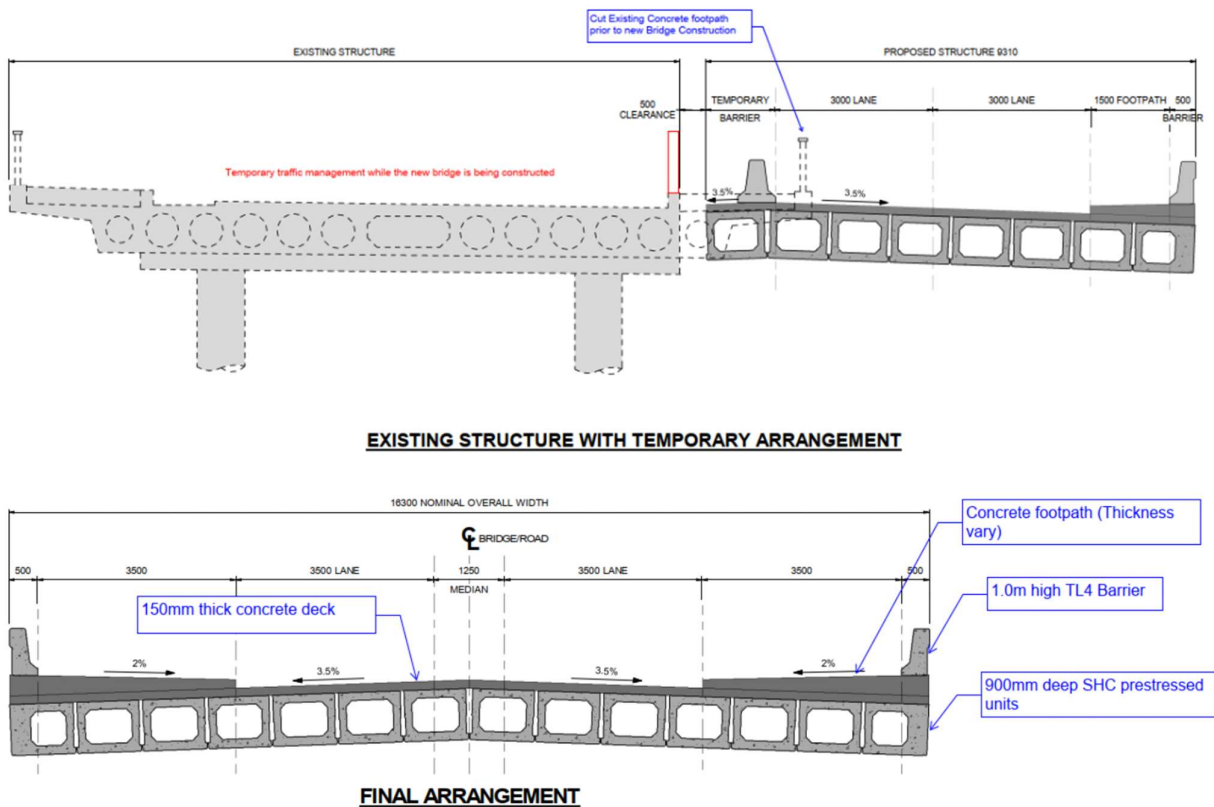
Ghuznee St Bridge potential construction methodology. Upper figure shows intermediate stage and the lower figure the completed arrangement. Source: 03 TT Design Assumptions, Details and Construction Considerations produced by Waka Kotahi April 2025.
